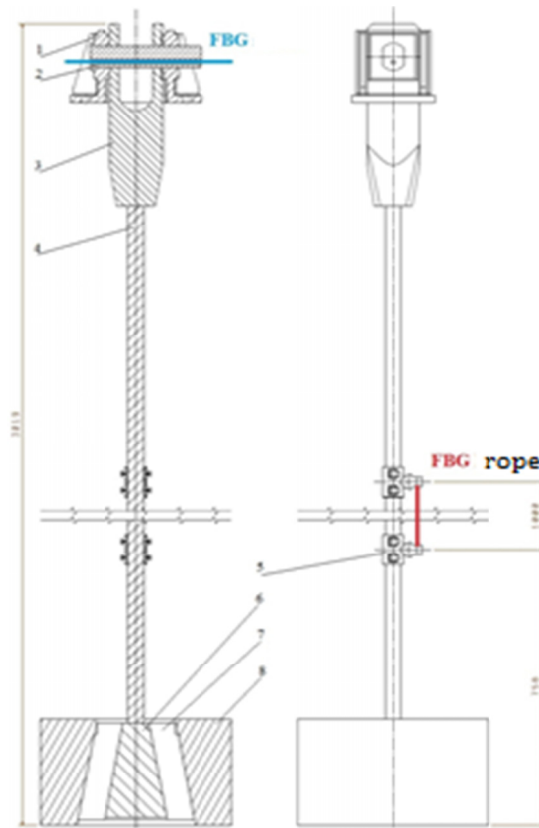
Layout of the measurement bench: 1 – body, 2 – bolt, 3 – conical handle with eyes, 4 – closed structure rope, 5 – optic fiber holder, 6 – conical rope end, 7 – mount cone, 8 – well
